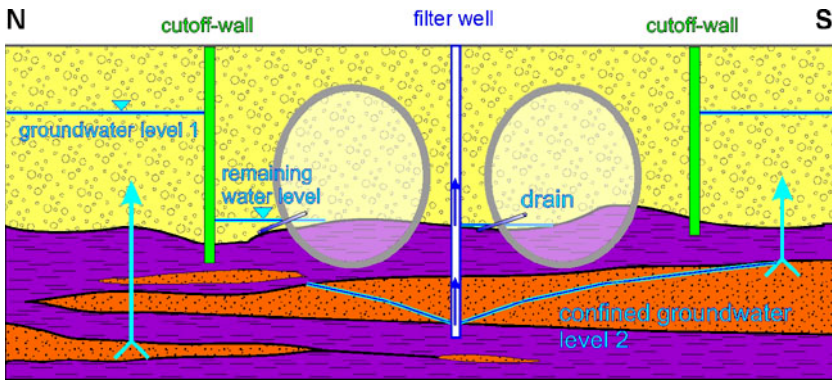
Single-track tunnels of section W4.1 with cutoff-walls and arrangement of wells.
